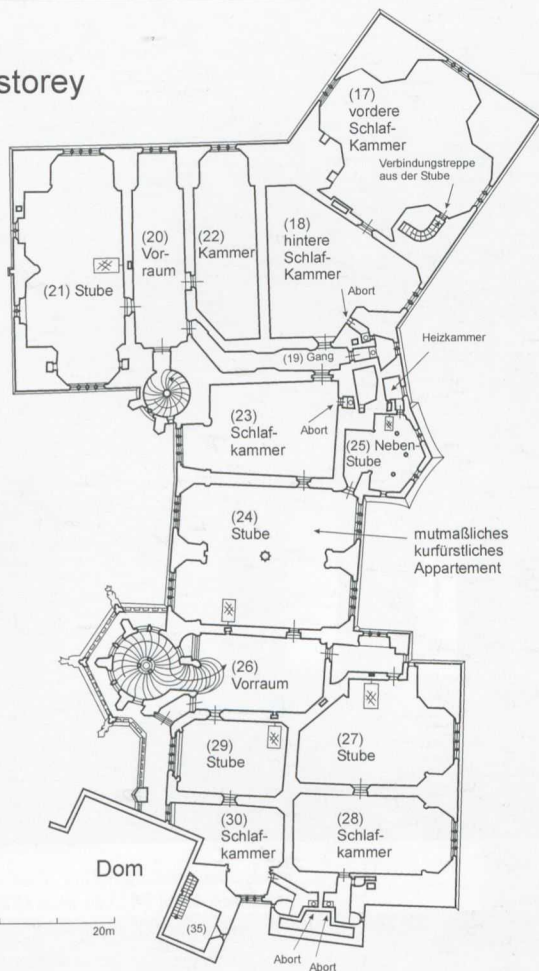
Ingolstadt Castle (*Neues Schloss*), 1479-c. 1489, plan of the 1st storey (plan Staatliches Bauamt Ingolstadt 2007 and Hoppe).
